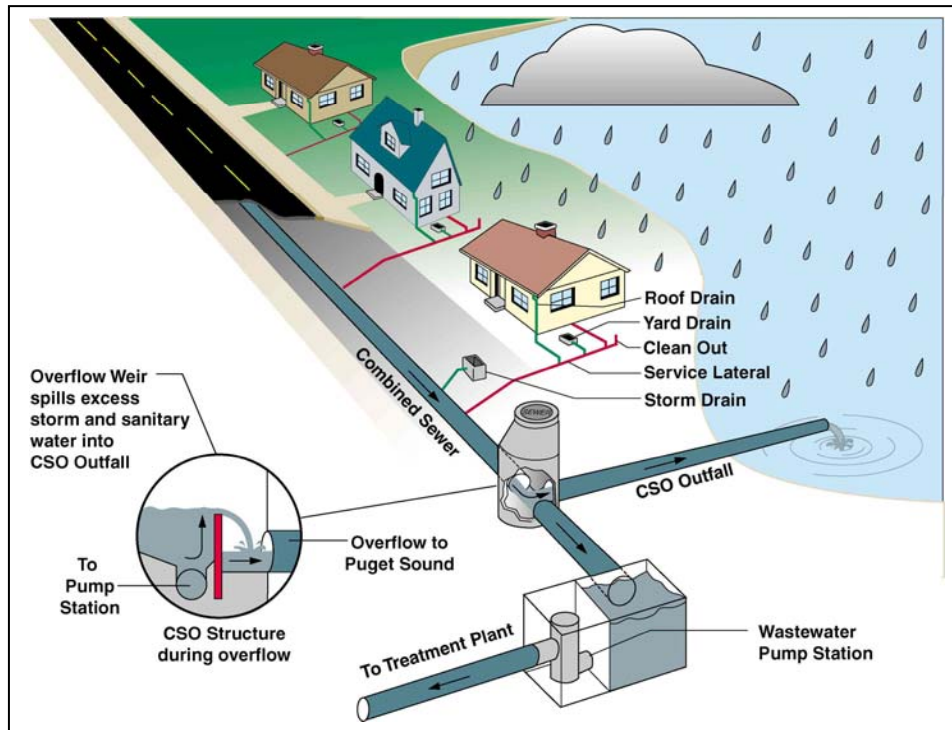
1992: A Combined Sewer Systems Overflow Accommodates Volumes of Stormwater from Streets, Roofs, Driveways, and Foundation Drains, as well as from Infiltration Sources (COB 2005)
